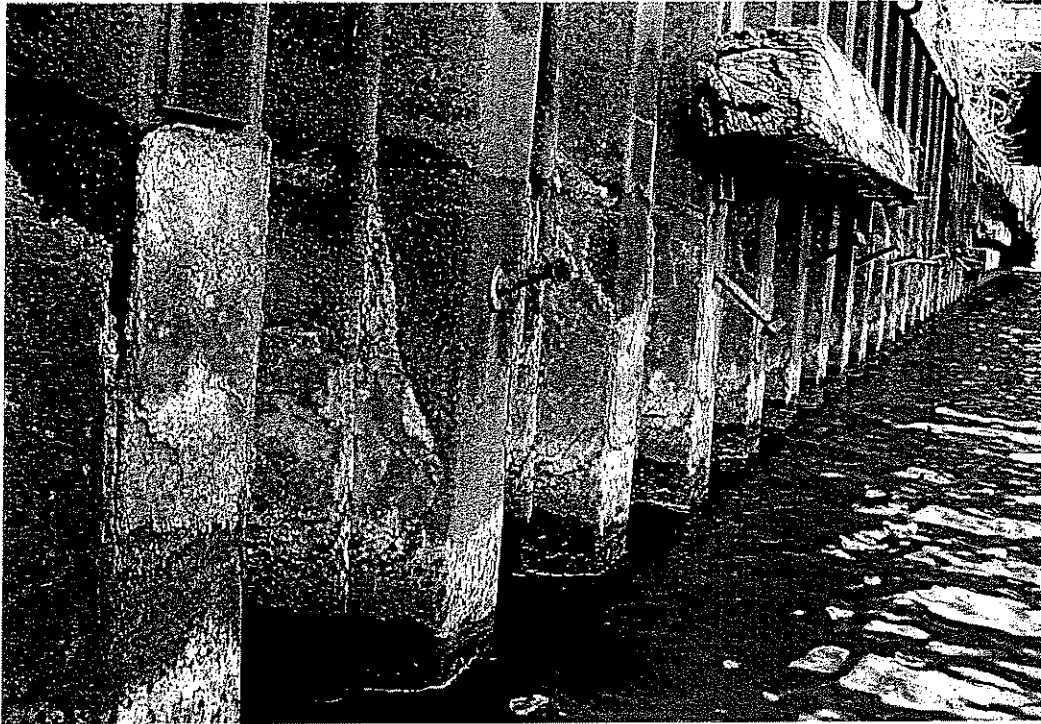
View of Typical Steel Condition at Station 8+00, Looking West.
